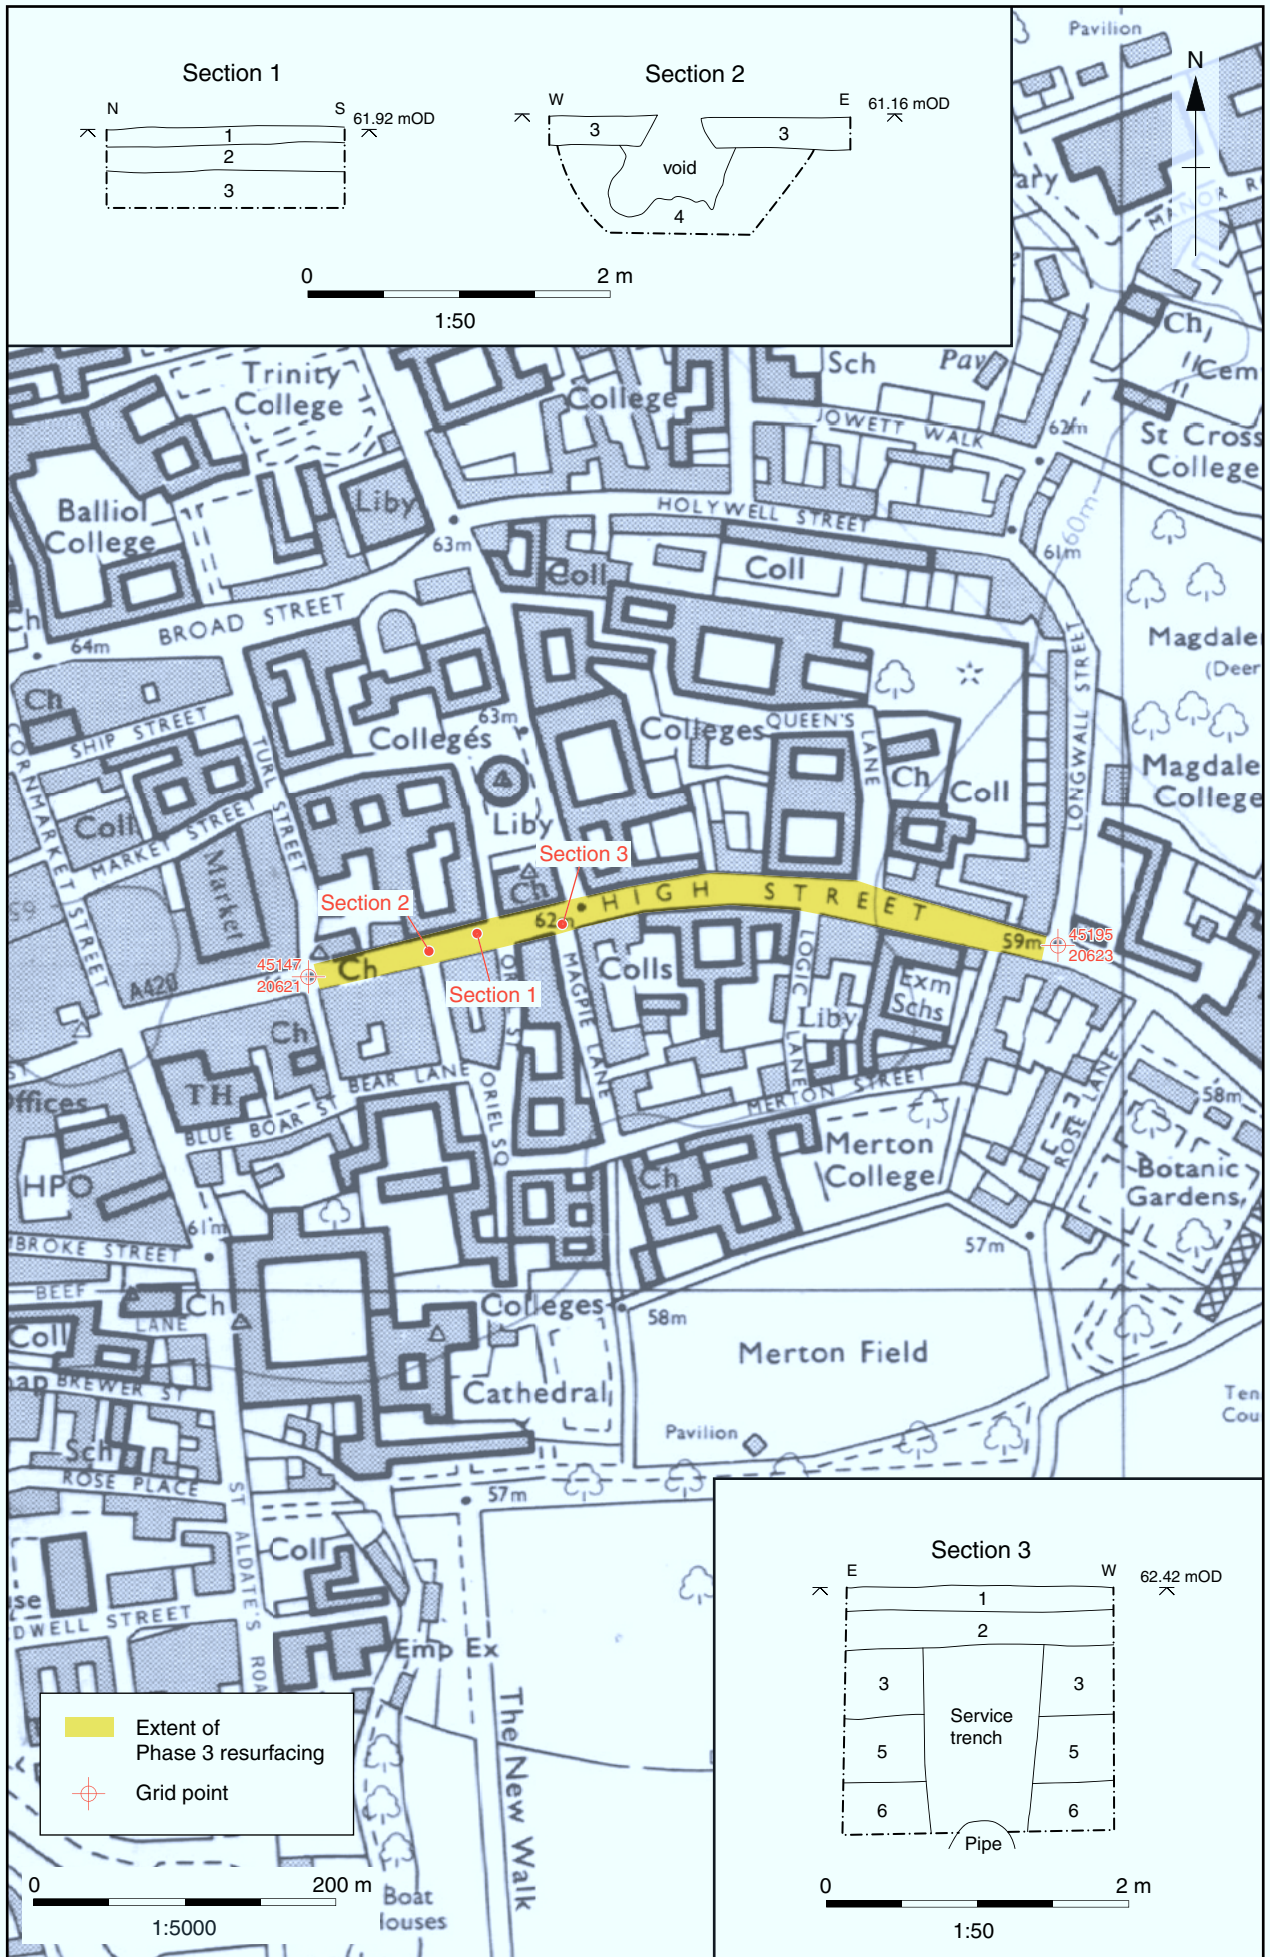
Plan of extent of work and location of sections and detailed sections 1-3
